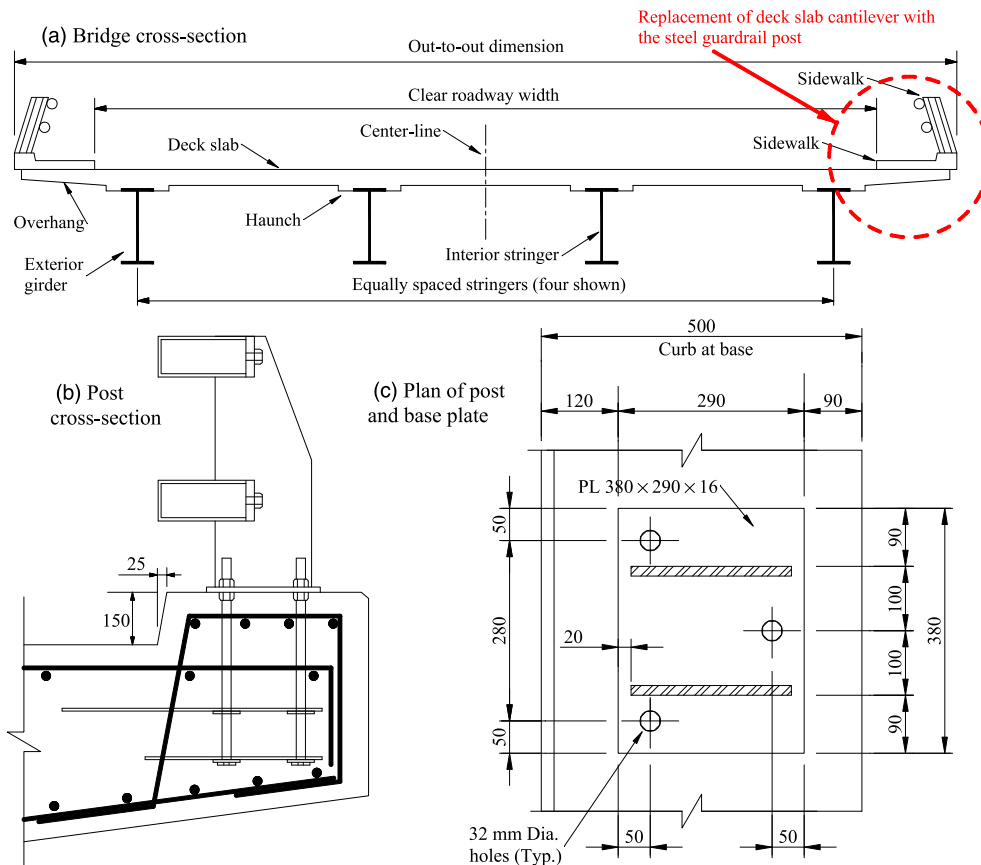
Schematic diagram of post deck cantilever joint under consideration: (a) bridge cross section; (b) post cross section; (c) plan of post and base plate
